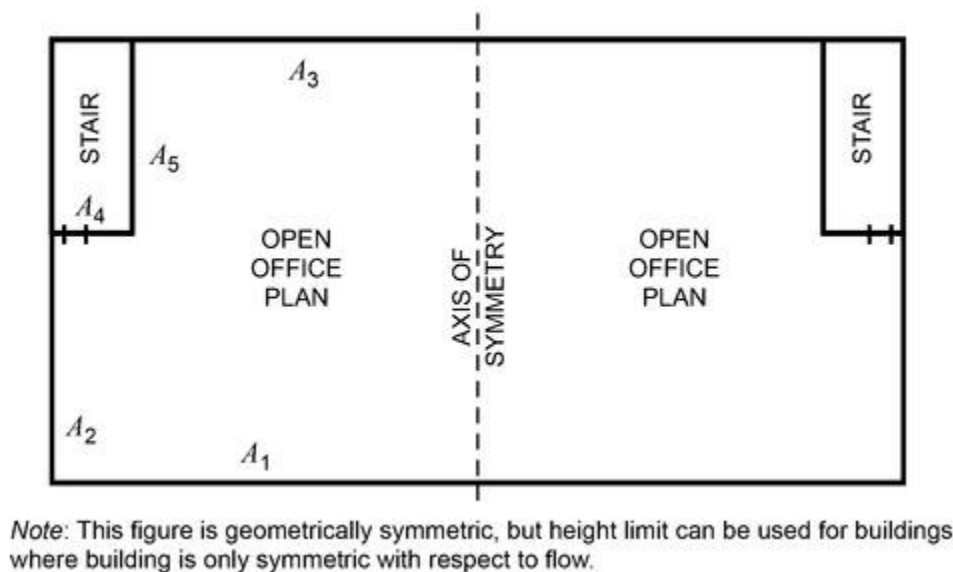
Example for Effective Flow Areas of Building with Pressurized Stairwells
